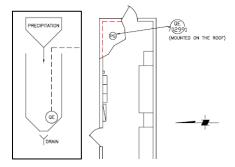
Example of Precipitation Gauge mounted on roof at Schoolcraft Pump Station
